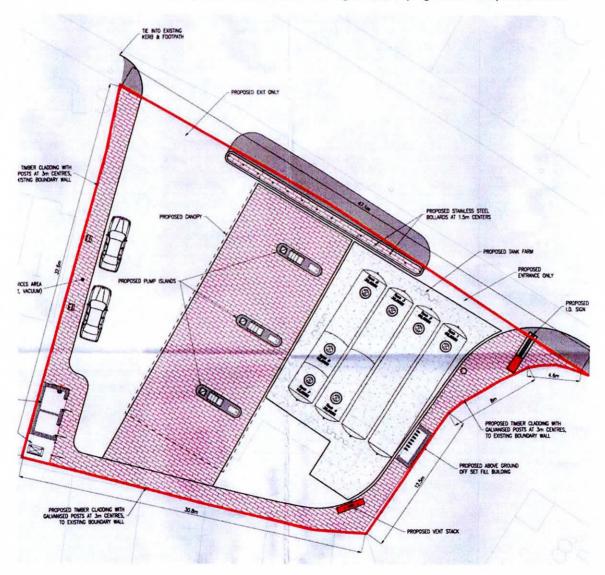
Site layout plan approved under Reg. Ref. 4353/17.
